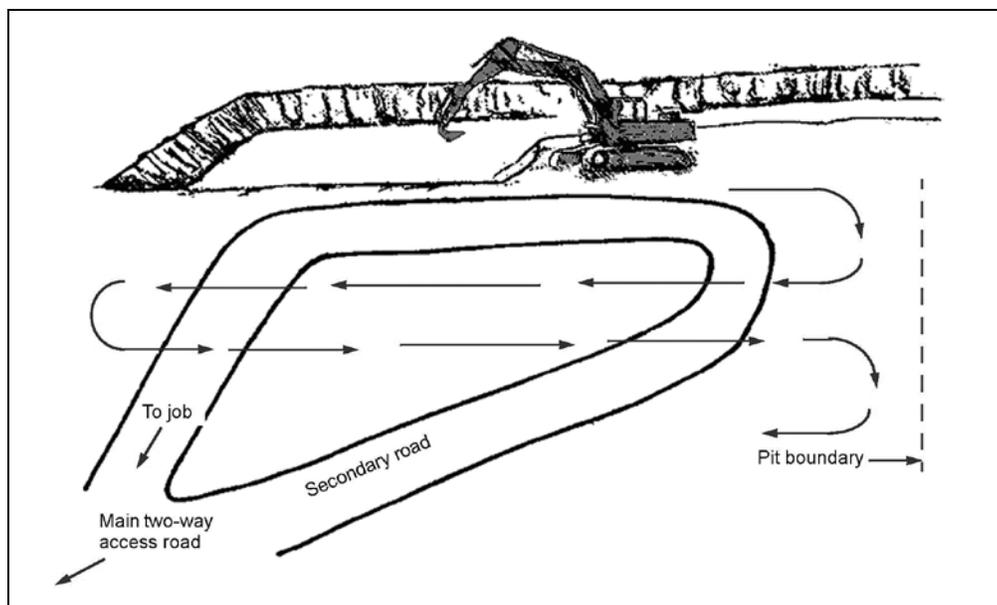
Layout and development of a subsurface pit using a hydraulic excavator
